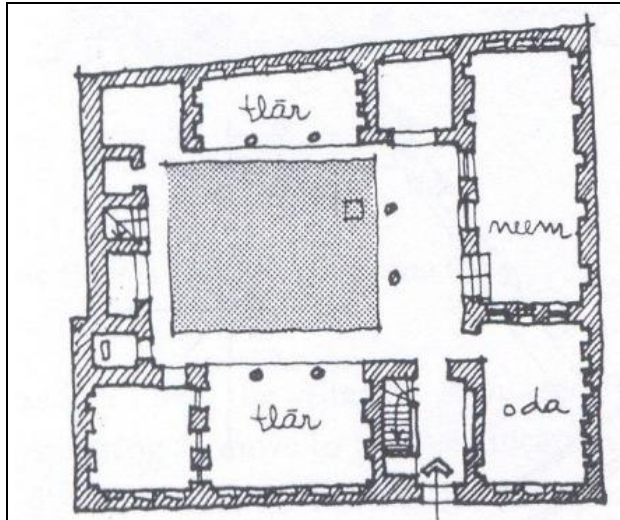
Ground Floor Plan of a typical Baghdad House (Source: 6000 years of Housing by Norbert Schoenauer)
